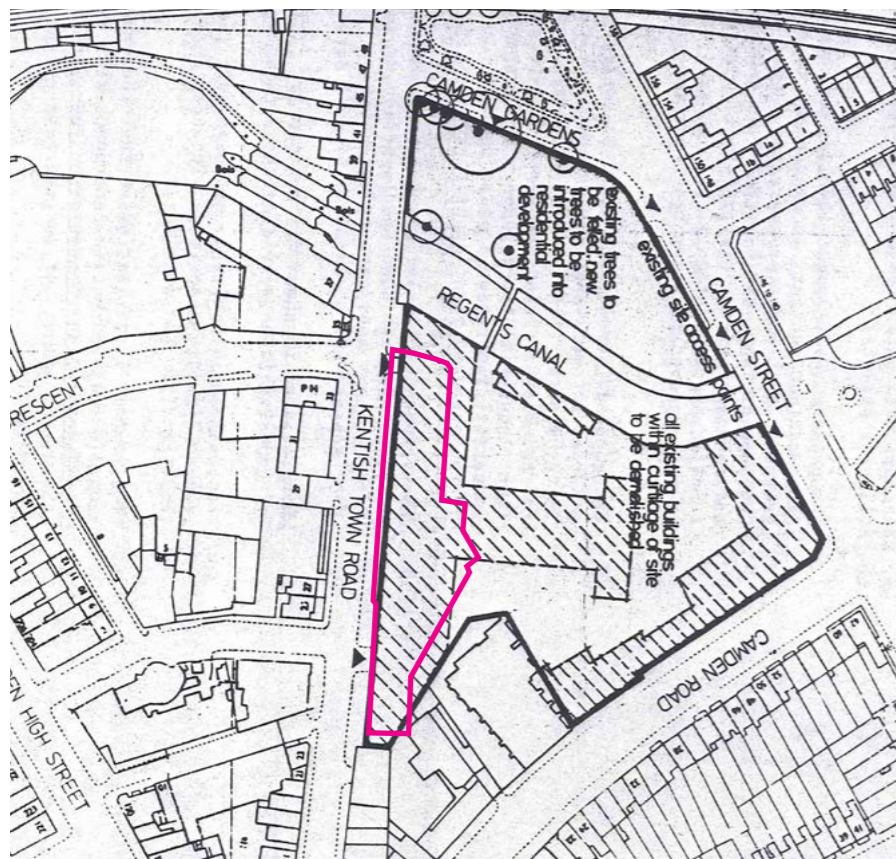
1985 site plan, site marked in red (LB Camden Local Archive)
